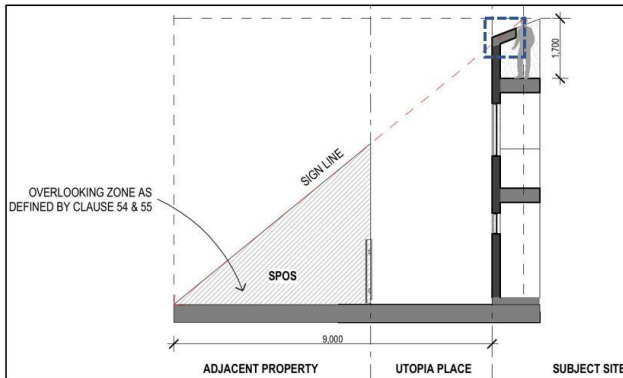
Section showing built-form limiting overlooking from Unit 4 roof terrace
